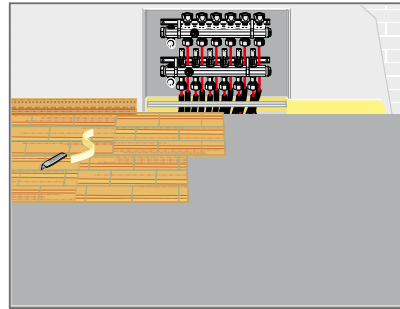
Application of the floor covering according to manufacturer's instructions.
